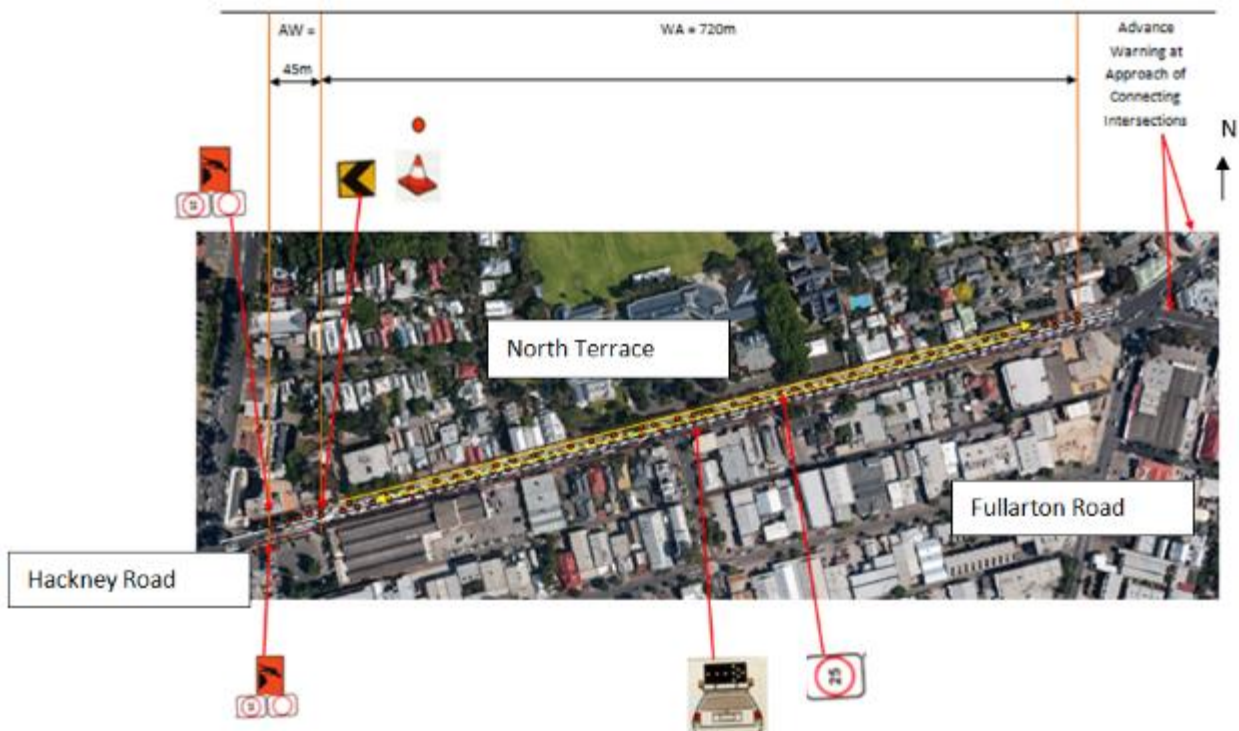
Workzone Setup-Two Lanes Closed Inbound, Entire Road Length, Work Area
